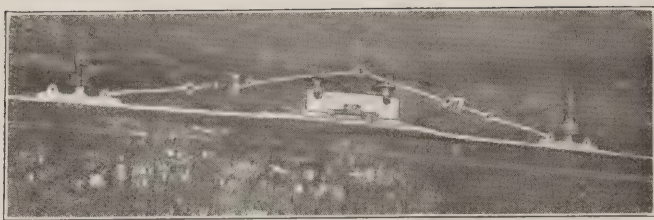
A SECTION INSULATOR ANCHORED IN PLACE
